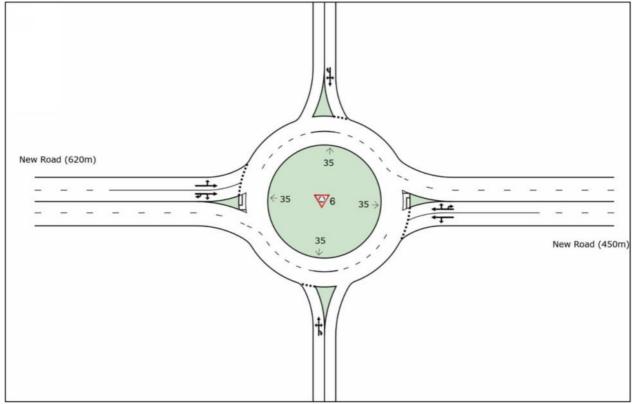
Interim 2026 SIDRA Intersection Layout - Aldington Road/Site Access (Source: Ason Group 2021)
